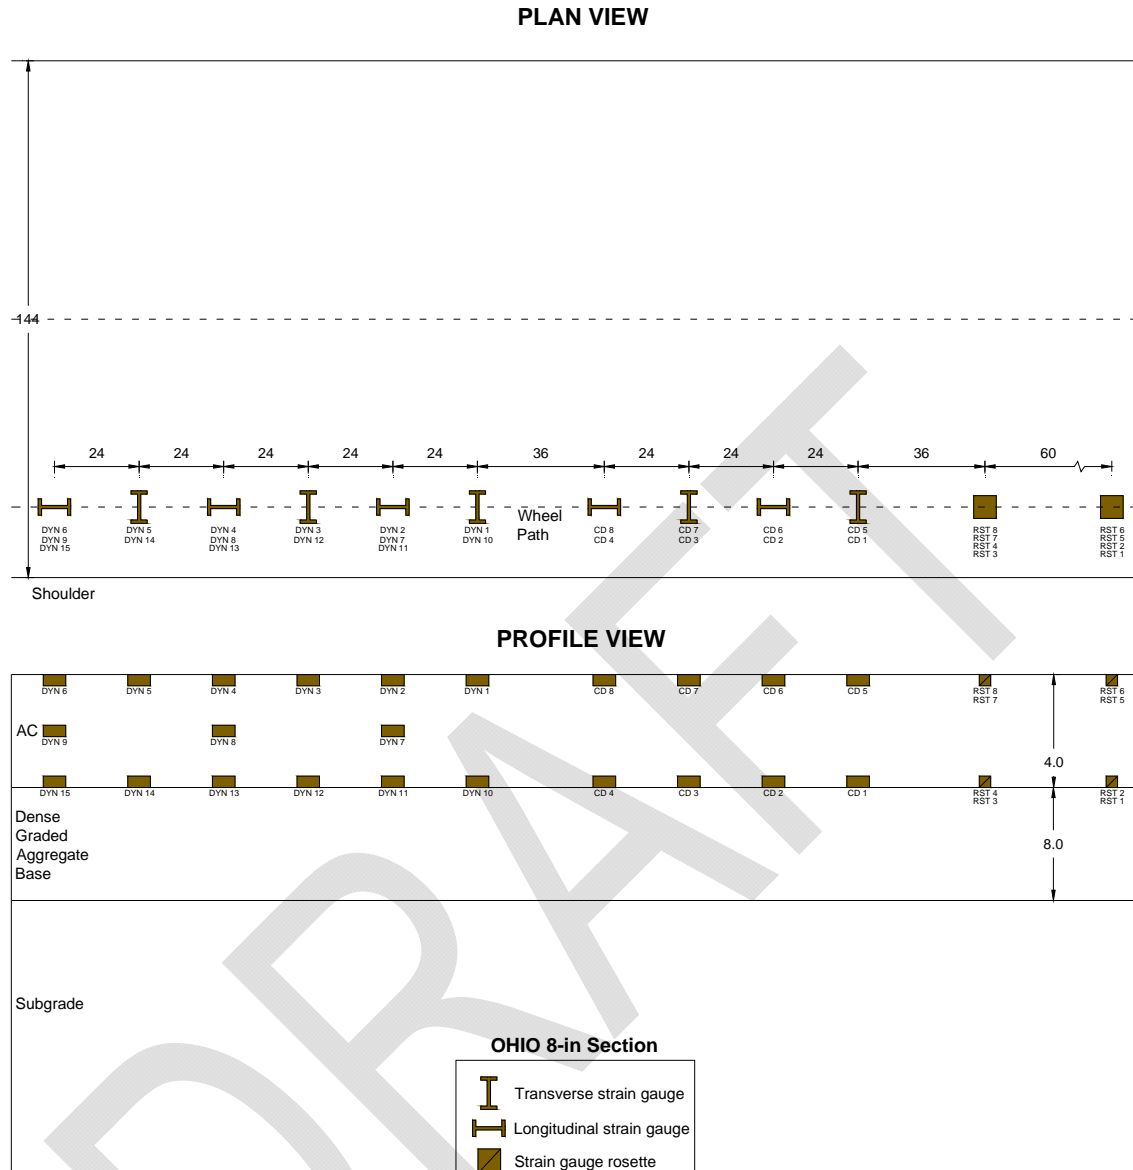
Plan and profile view of pavement structure and instrumentation of 8-in section, Ohio SPS-8.
